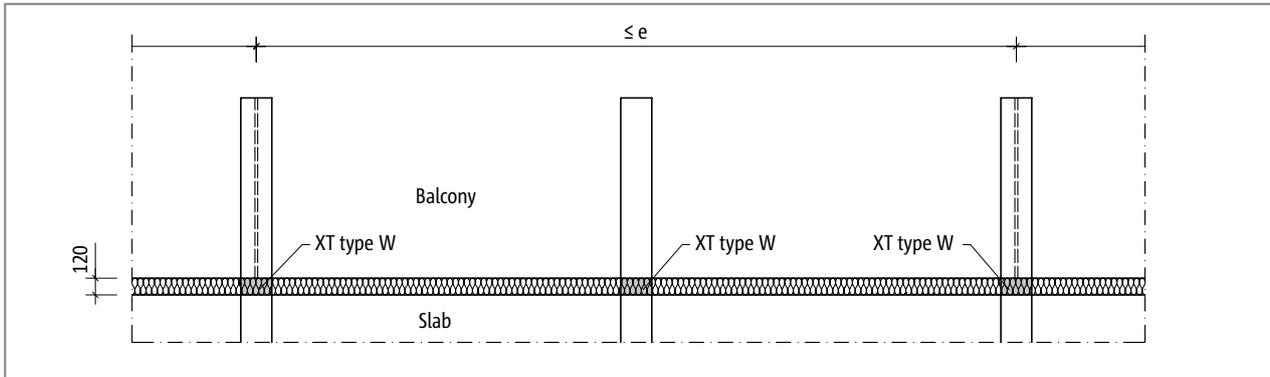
Schöck Isokorb® XT type W: Expansion joint arrangement
